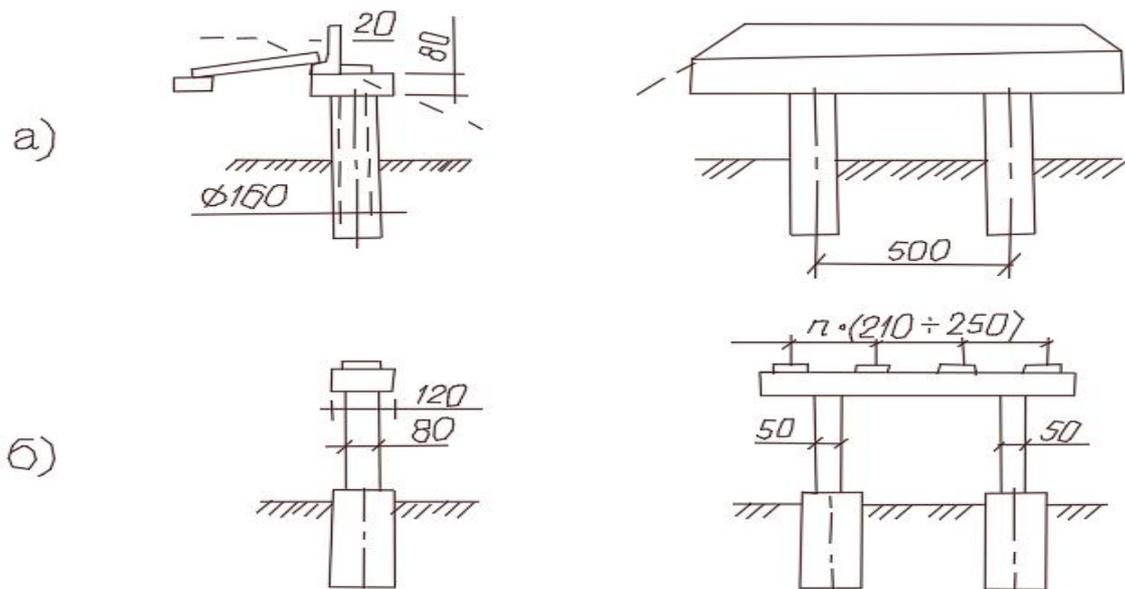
Fingerless supports: a - foundations of a road bridge;
